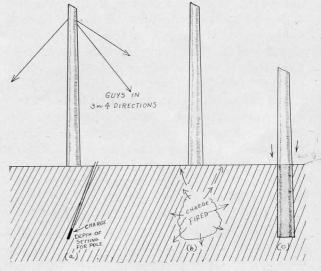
SETTING A TELEPHONE POLE BY BLASTING
